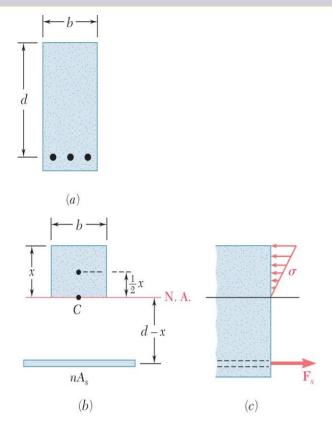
Reinforced concrete beam: (a) Cross section showing location of reinforcing steel. (b) Transformed section of all concrete. (c) Concrete stresses and resulting steel force.
